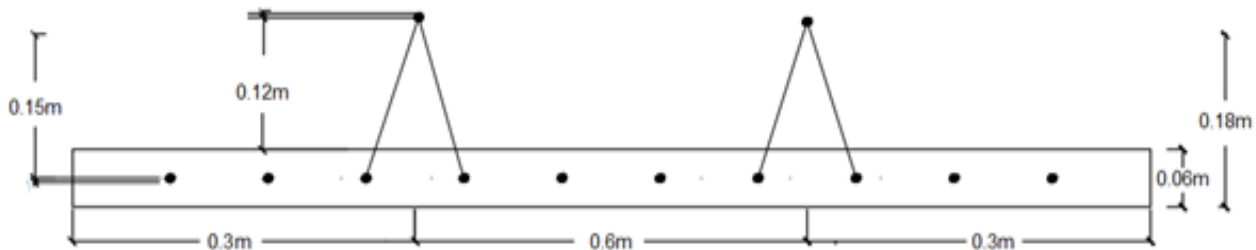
Section view of plate-1 for the construction stage (Light Weight)
